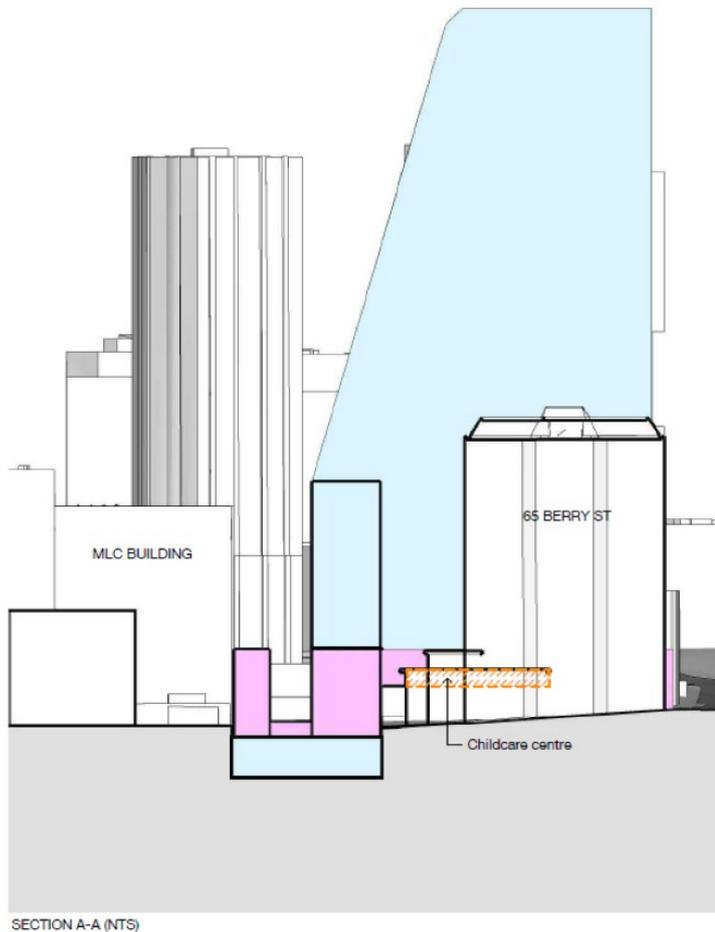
Extent of station construction adjacent to 65 Berry Street (the extent of the approved station structure shown in pink and the proposed OSD building envelope shown in blue)
